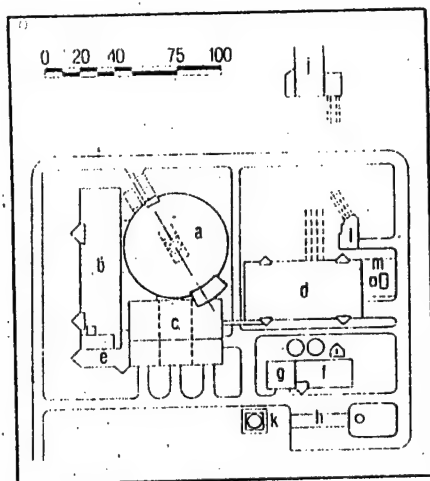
Plant layout. The balance of plant is designed to ensure economy in construction and operation. The following aspects are considered in the arrangement of the building: clear energy flows, short piping and cable runs; good access for construction, erection, operation and maintenance; adaptability to future extension; and, clear separation of the controlled area for radiation protection purposes.
